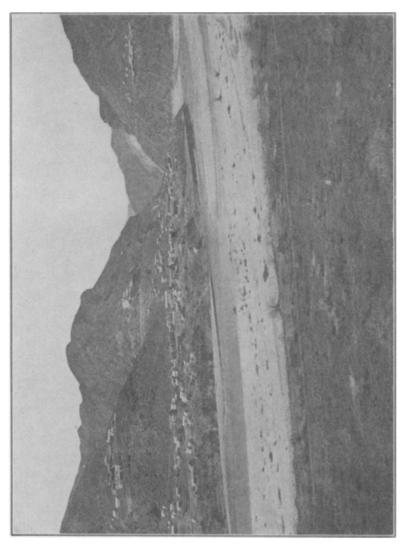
PLATE I.—Roosevelt dam site, looking down-stream. Buildings in upper left, engineers' camp; upper center, cement mill and sand crusher; on the right, contractor's camp; lower bench, temporary town of Roosevelt, which will be submerged when reservoir fills.
